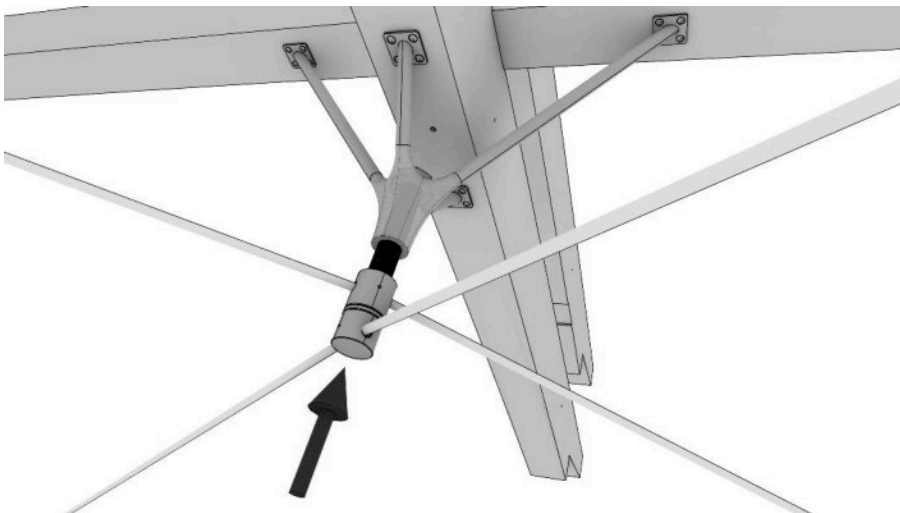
Kingpost. Illustrating tensioning of cable net via tightening a single threaded rod
